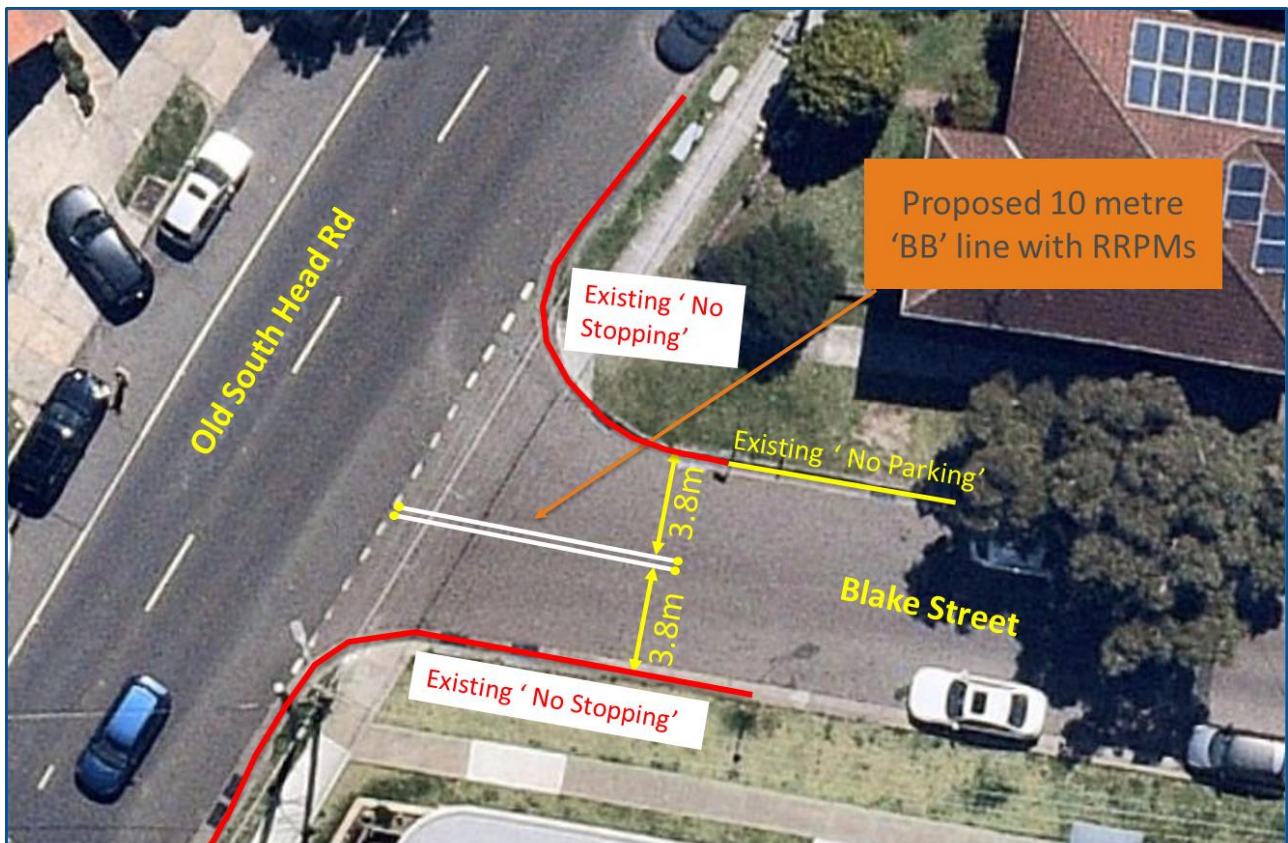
Proposed 10 metre BB line and raised reflective pavement markers (RRPMs).
